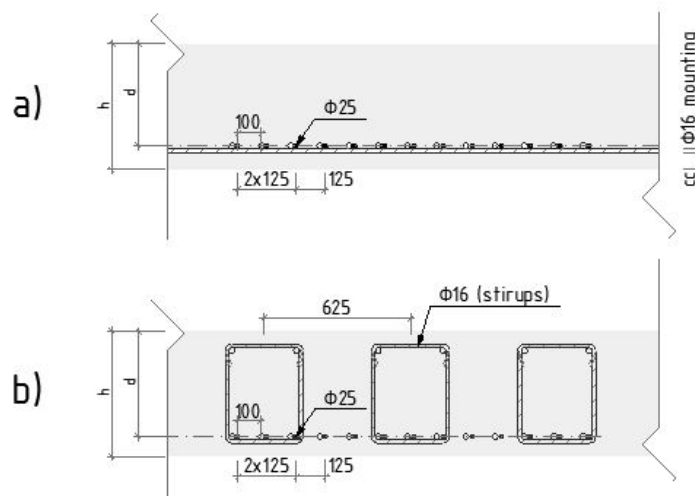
Reinforcement design with 1 layer of tension reinforcement. a) section without shear reinforcement. b) section with shear reinforcement.
